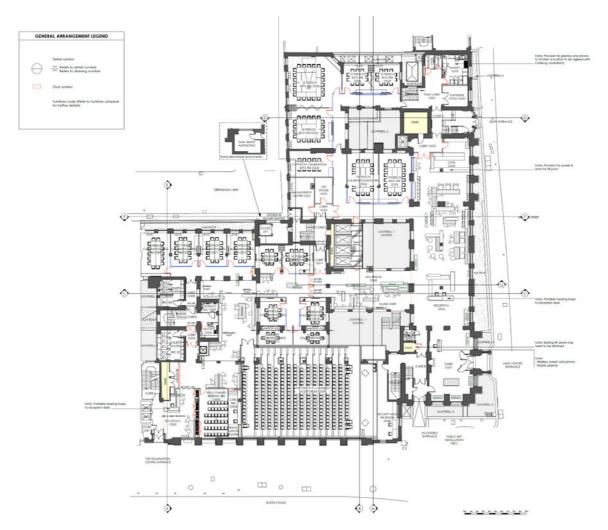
Pedestrian access to RCGP building at proposed ground floor plan as submitted by Tilney Shane Ltd for planning permission and LBC in 2010, *Camden Council 2024.
